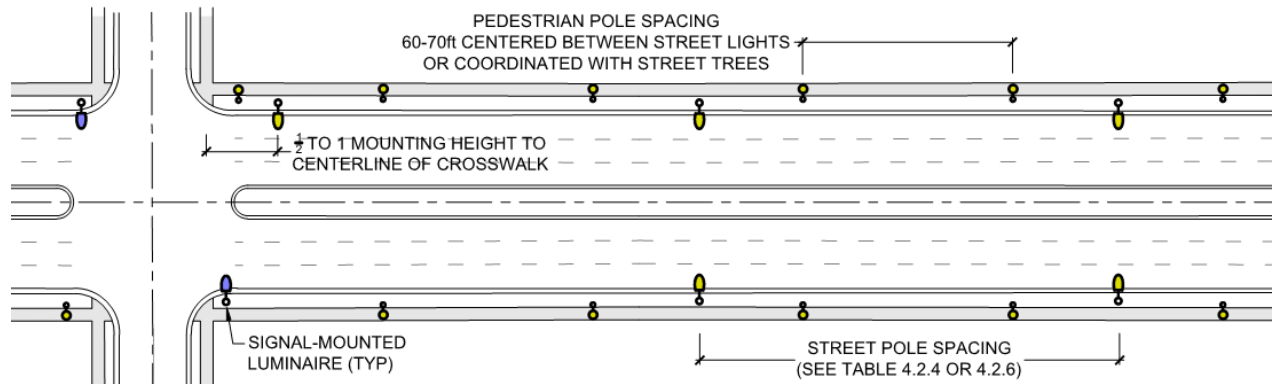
Typical Arterial Street with Pedestrian Lighting Section
